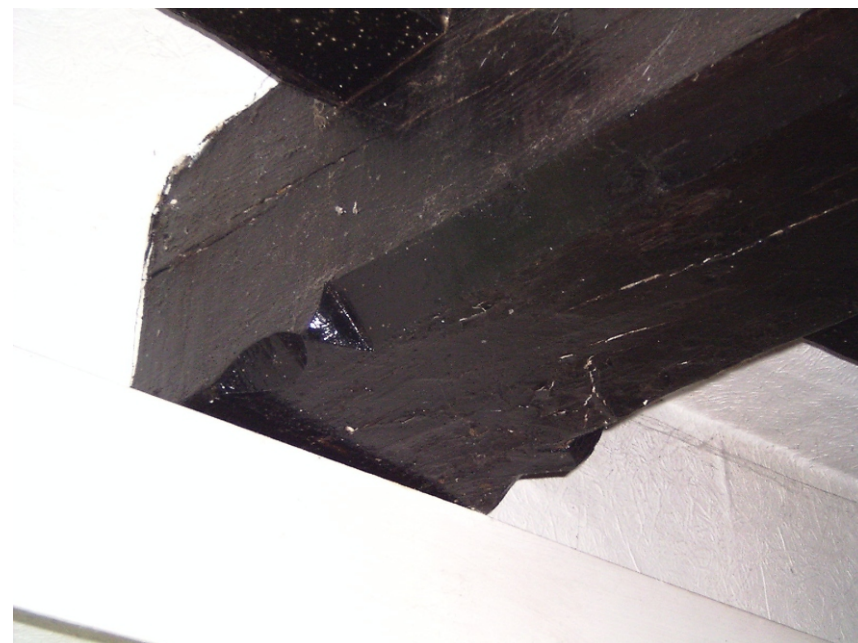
Interior of Well House. Ground floor, detail of chamfered beam stops
